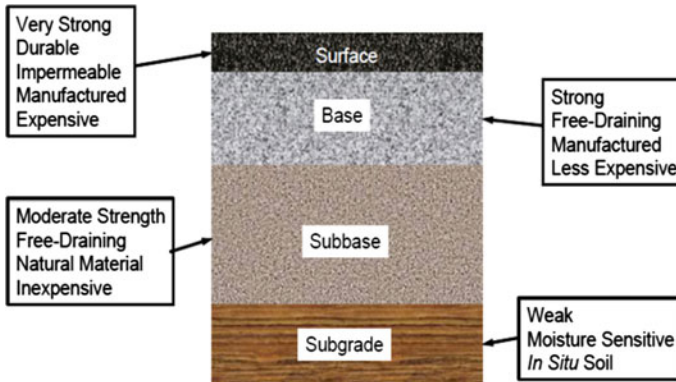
Typical cross section of flexible pavements (FHWA_NHI_05_037)
